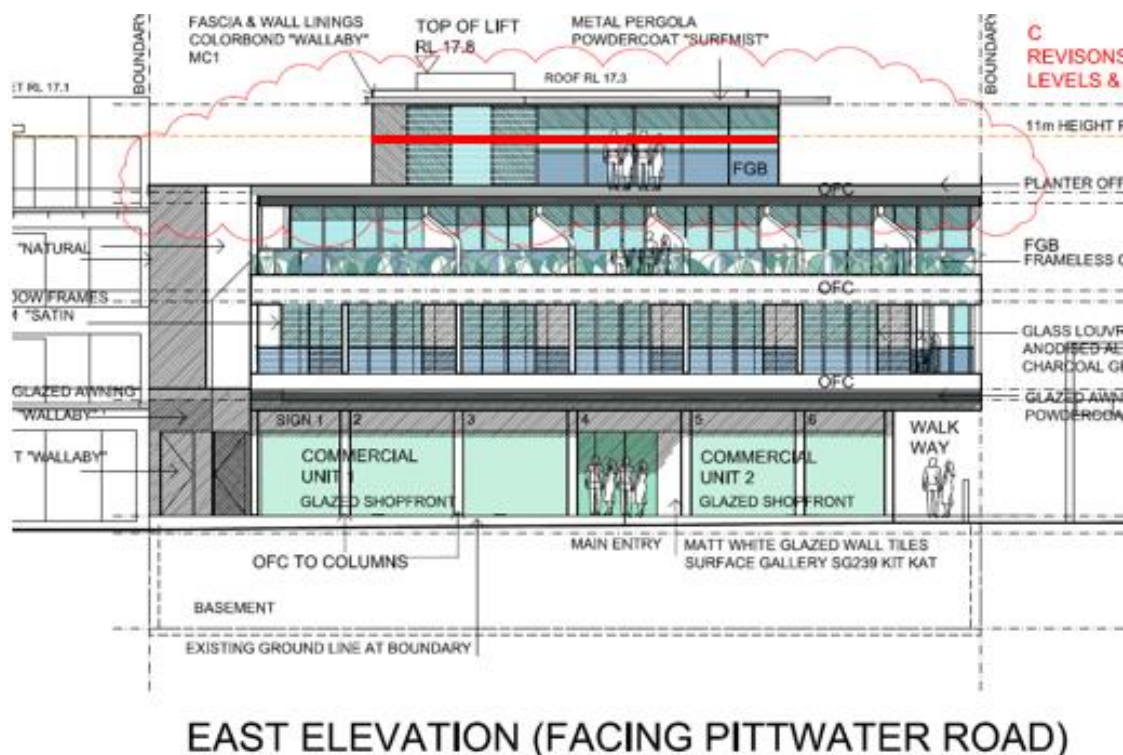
Plan extract showing extent of 11 metre building height breach as viewed from Pittwater Road with the red line representing the 11 metre height standard
